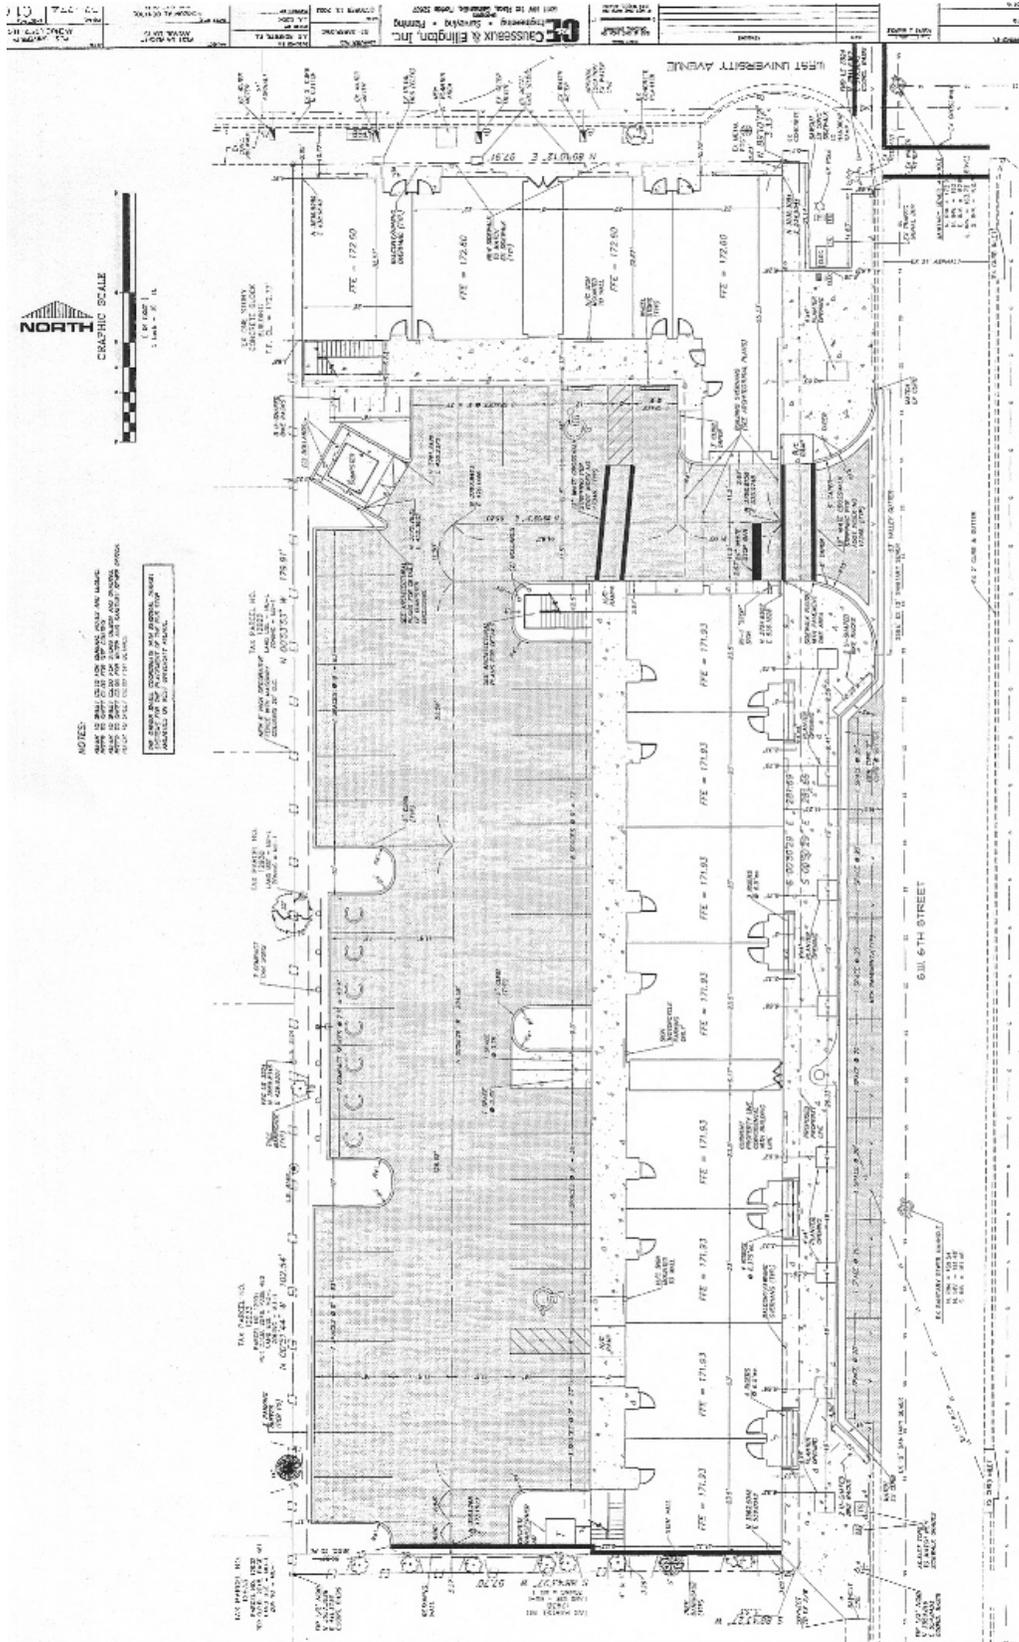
West University Ave. Lofts Building Plan (Causseaux & Ellington 2003)
